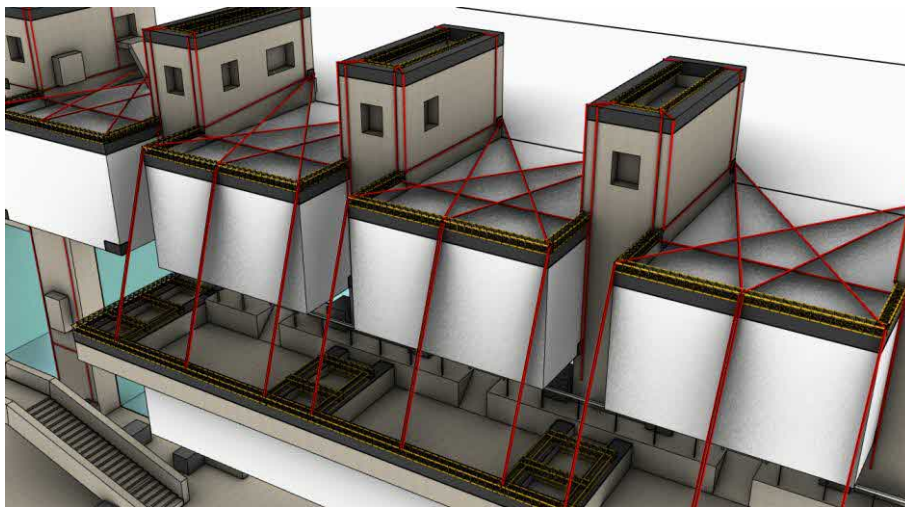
Close-up showing the horizontal cross-bracing at roof level
